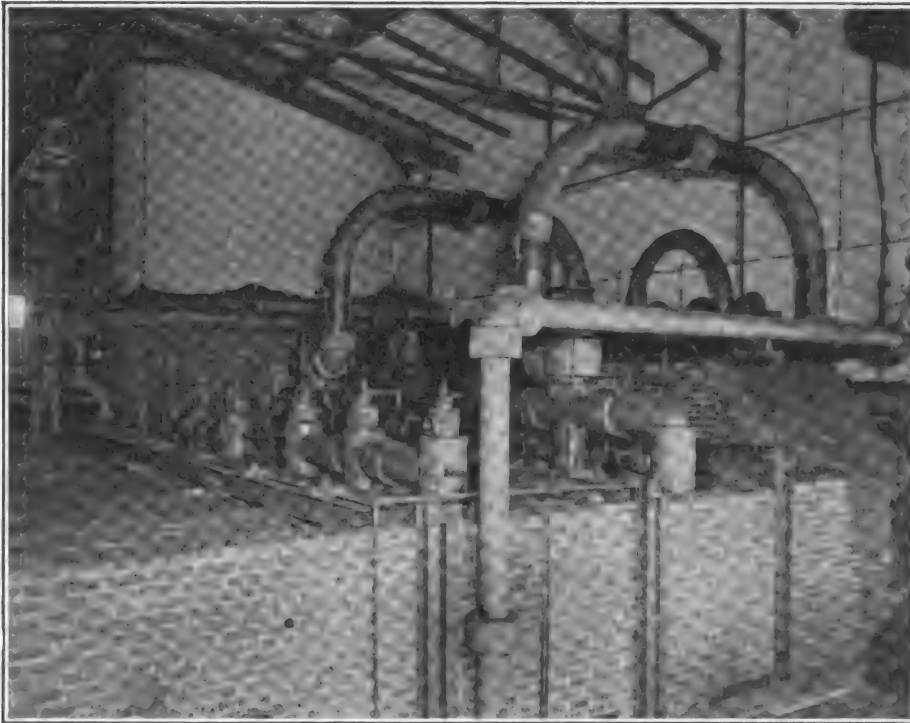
STEAM PIPING ABOVE BOILERS.
